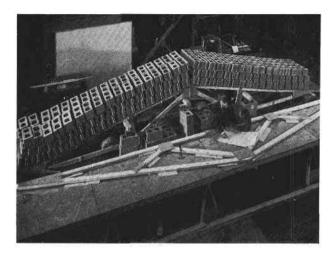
Load test on a prefabricated timber roof truss for use in house construction being carried out at the Building Research Centre of the National Research Council in Ottawa, Canada.
